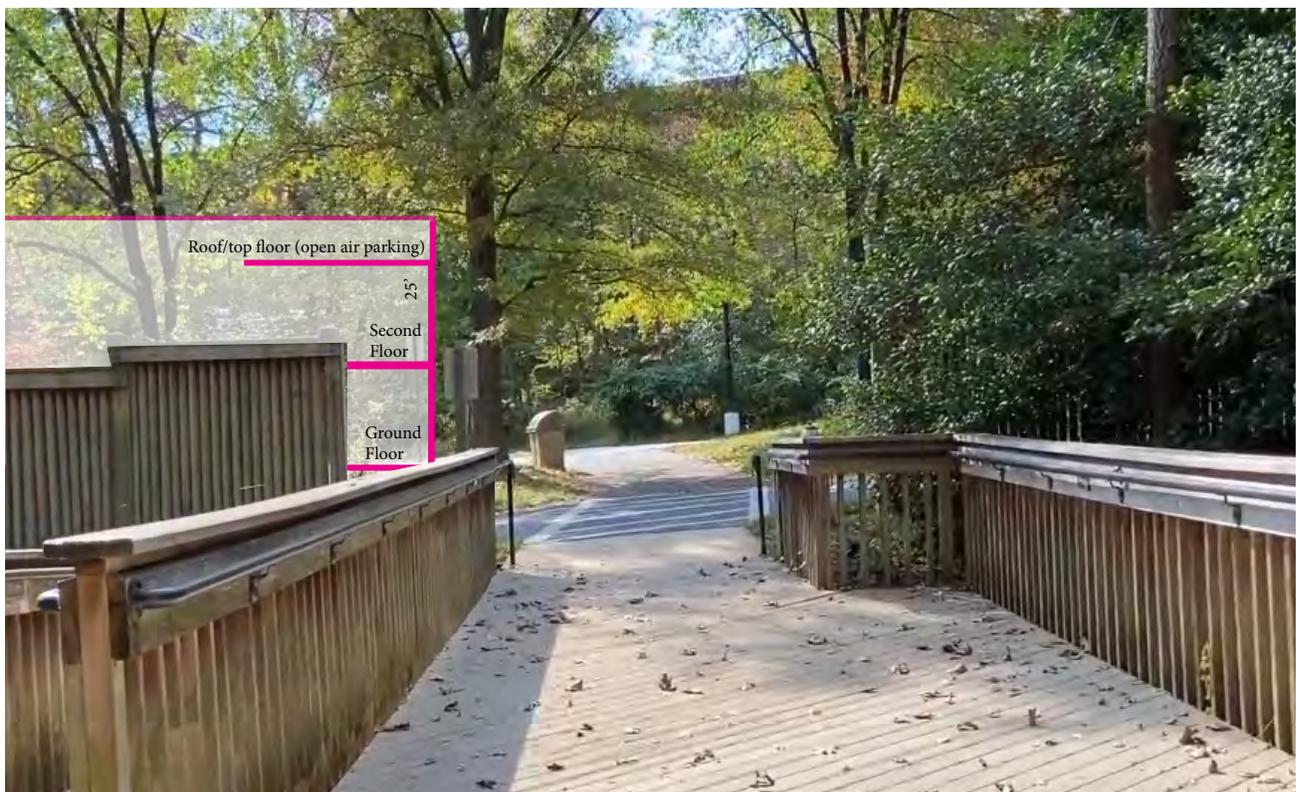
Proposed size and location of parking structure at Lot 4 (QE, 2020).
